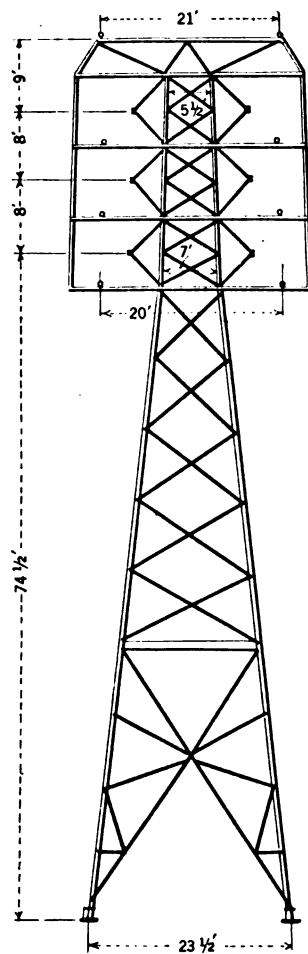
HEAVY 75-FOOT STRAIN TOWER
